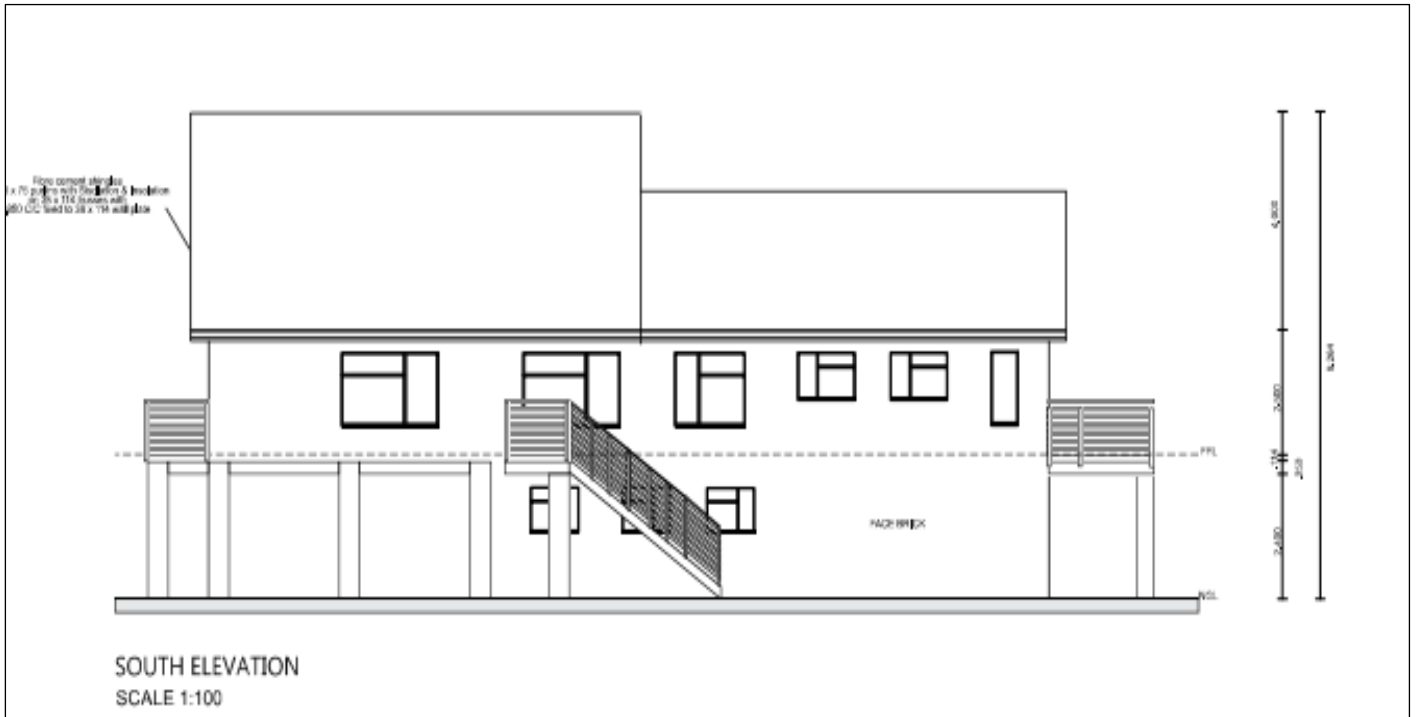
South Elevation of Proposed manager's accommodation units (Louv Designs, 2023)
